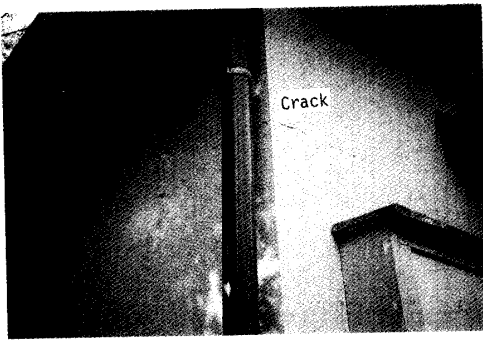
Crack in the concrete structure at the Kameyama Park (From Yamaguchi Prefecture).
